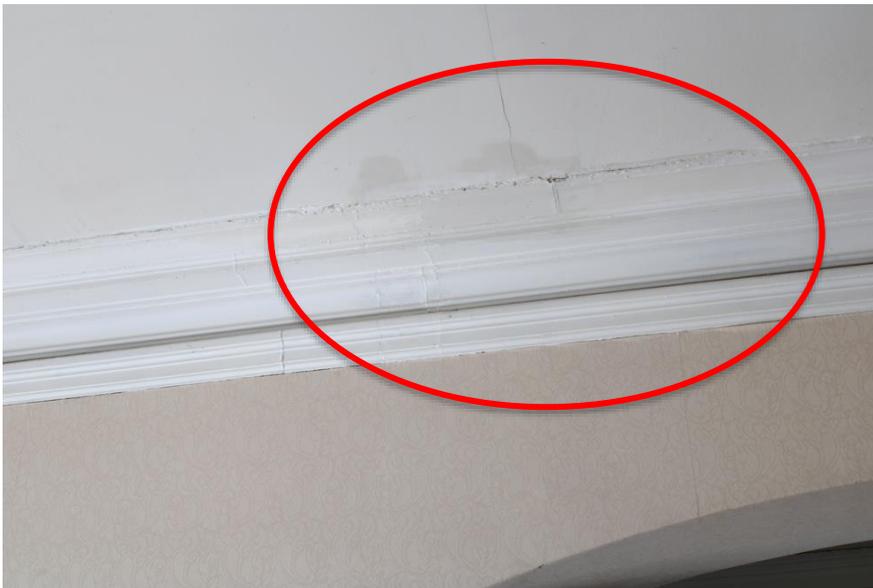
View of cornice, second floor stair hall, looking north. Note cracking and irregularity of finish at this location. Same condition is observed at opposite end of stair hall.
